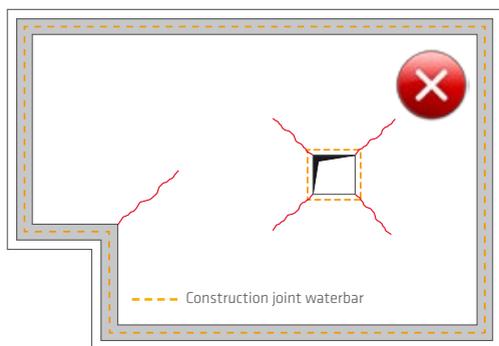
Diagonal cracks in a base slab at re-entrant corners and box-outs etc.
